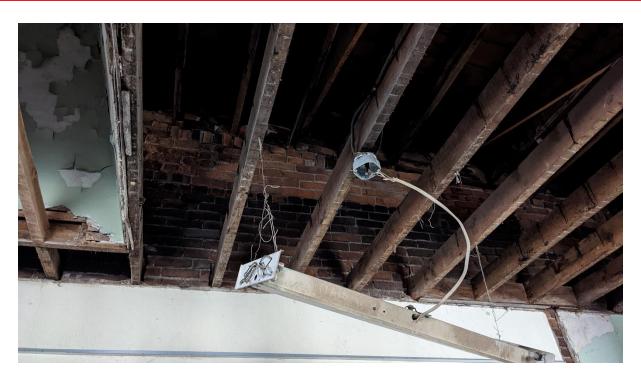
Deteriorated Mortar Joints along South Wall of 719
